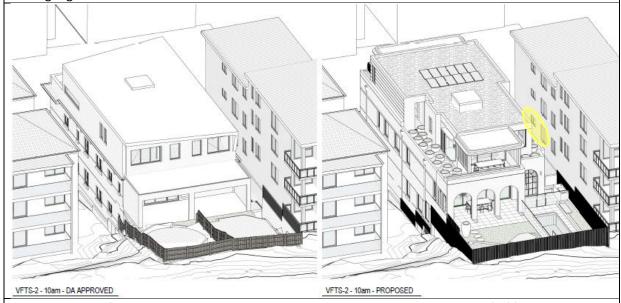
View front the sun, 21 June, 10am showing the DA approved building (left) and the subject proposal (right). The windows that will receive solar access as a result of the proposed amendments are highlighted.
